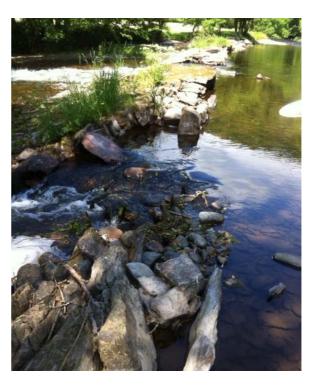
Dulverton Weir section showing flat facing stones (now buried under the temporary repair).
